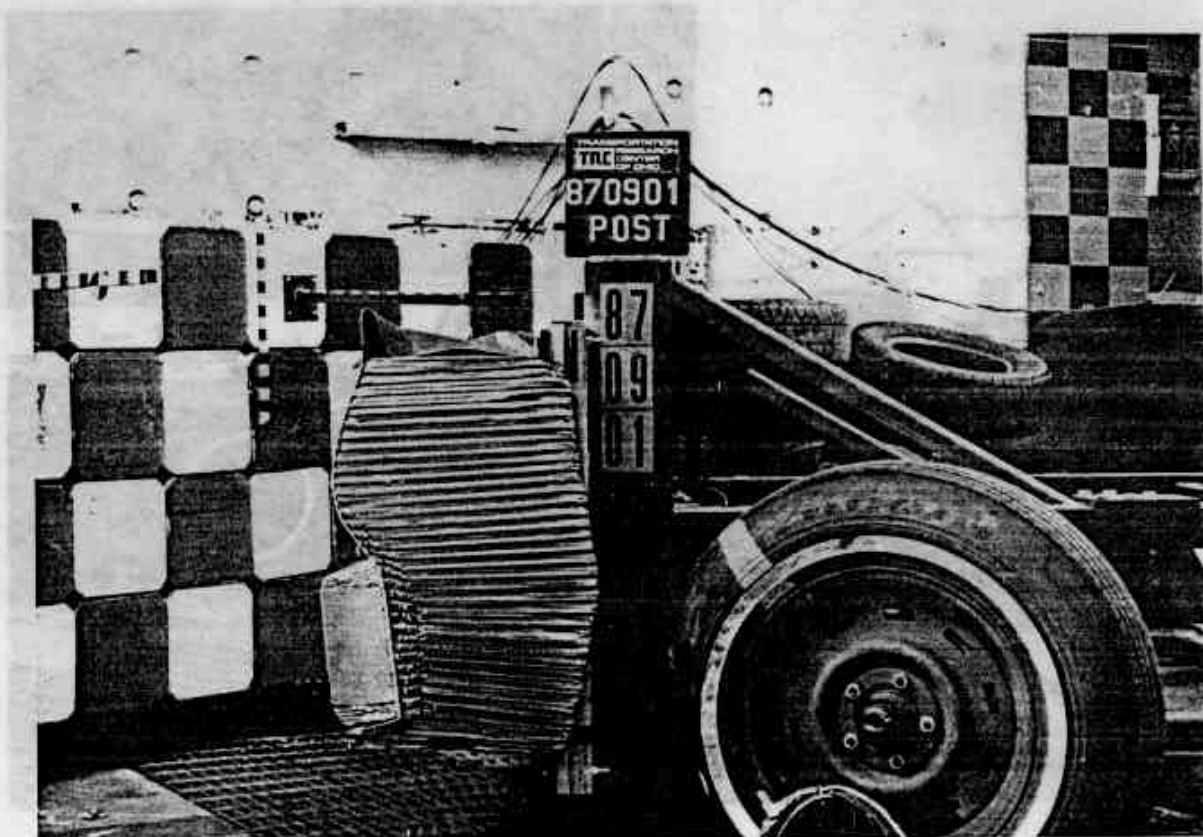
POST-TEST LEFT CLOSEUP VIEW
